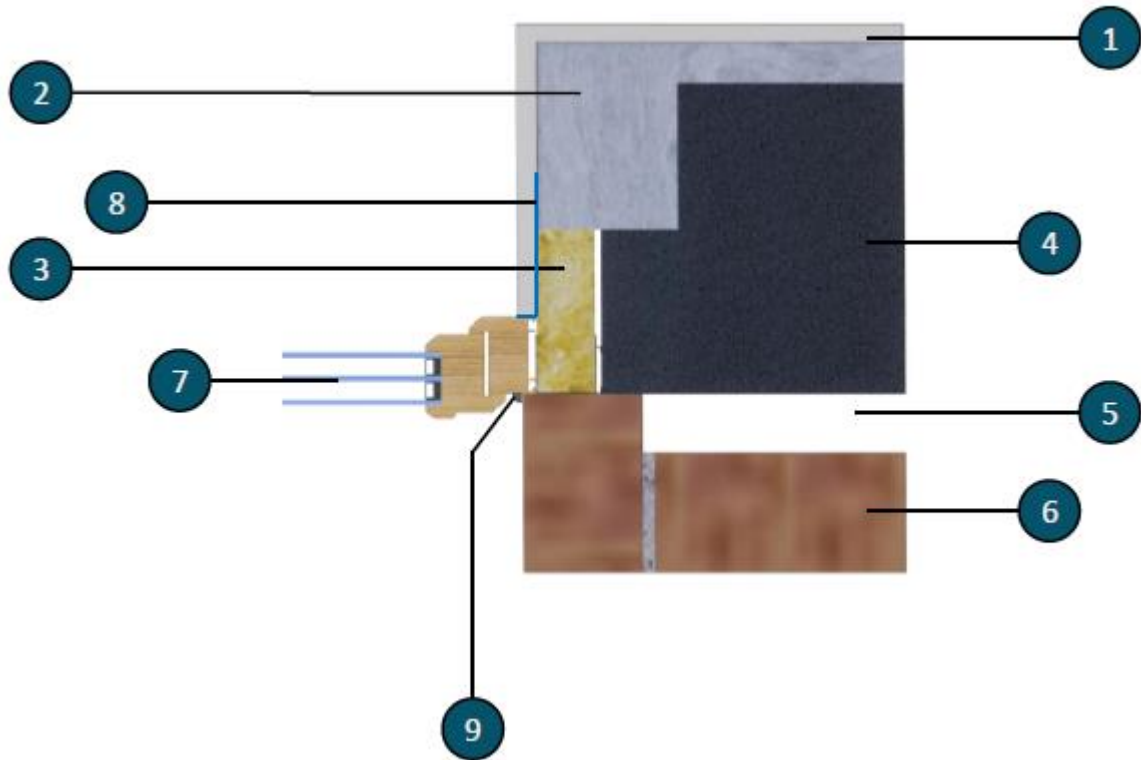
Window jamb – traditional brick/block outer leaf cladding
